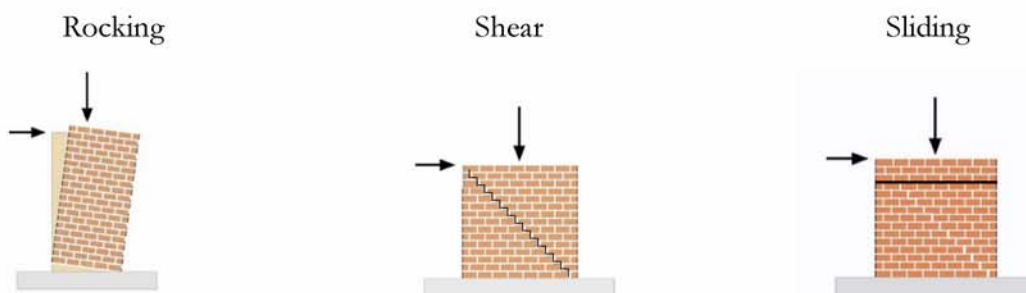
Failure modes of masonry walls in their plane and under lateral actions.
